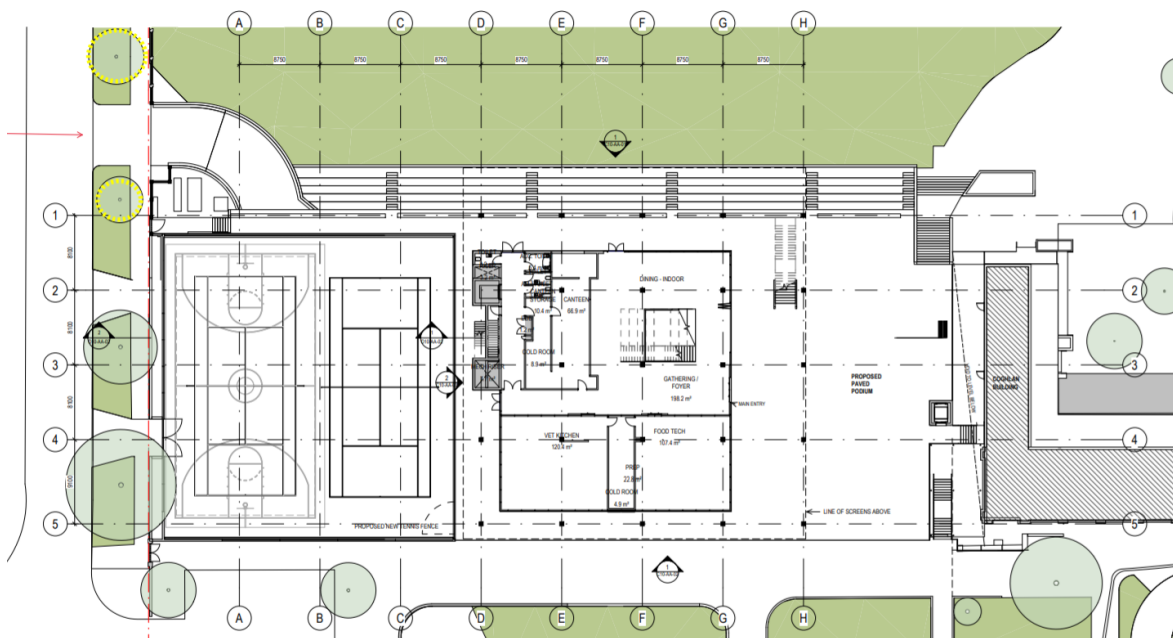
The ground floor plan showing new Tennis courts on the south-western side of the proposed building and a paved promenade on the north-eastern side.
